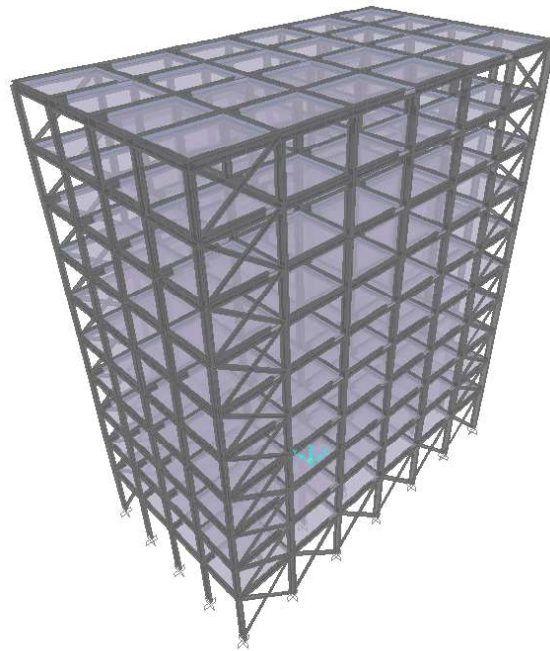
The schematic view of the 10-story steel structure with 1026 members.
